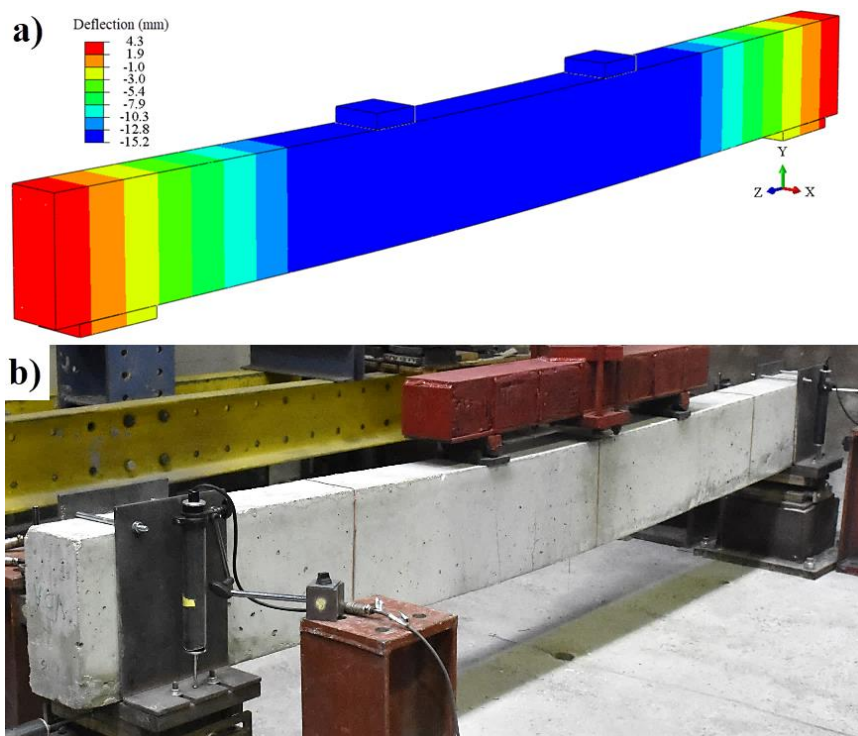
(a) Numerical (b) and experimental deformed shape for the CFRP-strengthened beam (specimen CFRP_AT) at the CFRP failure instant
